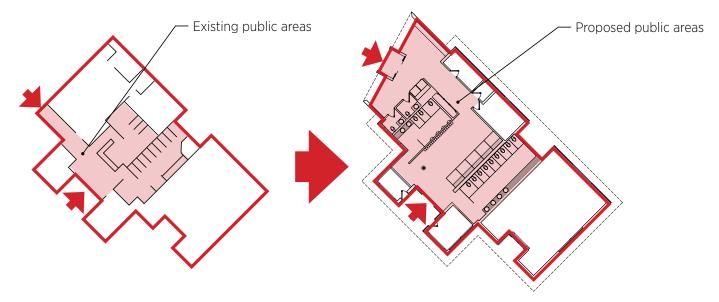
RENOVATING AND EXPANDING THE PARK CENTRE BUILDING WILL IMPROVE THE SPACES FOR PUBLIC USE
